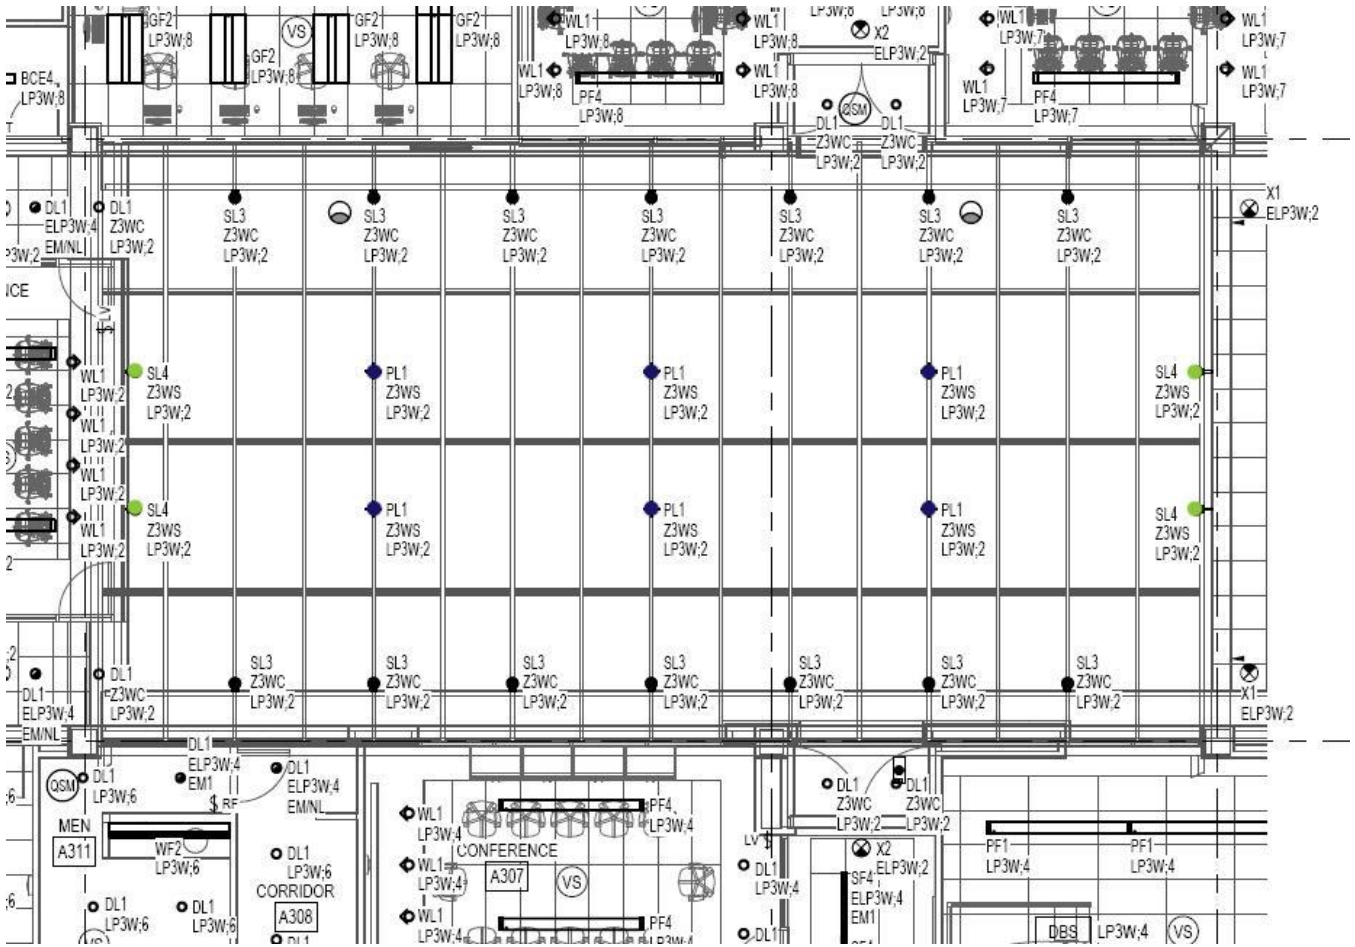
Third Floor Reflected Ceiling Plan of Skylight
